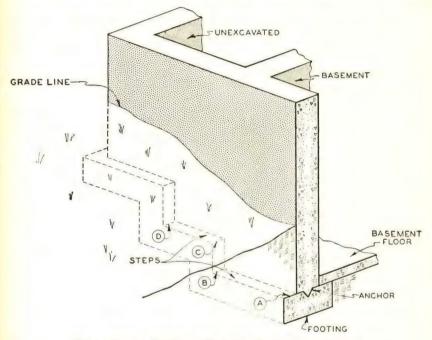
Method of Stepping Wall Footings in Sloping Ground
